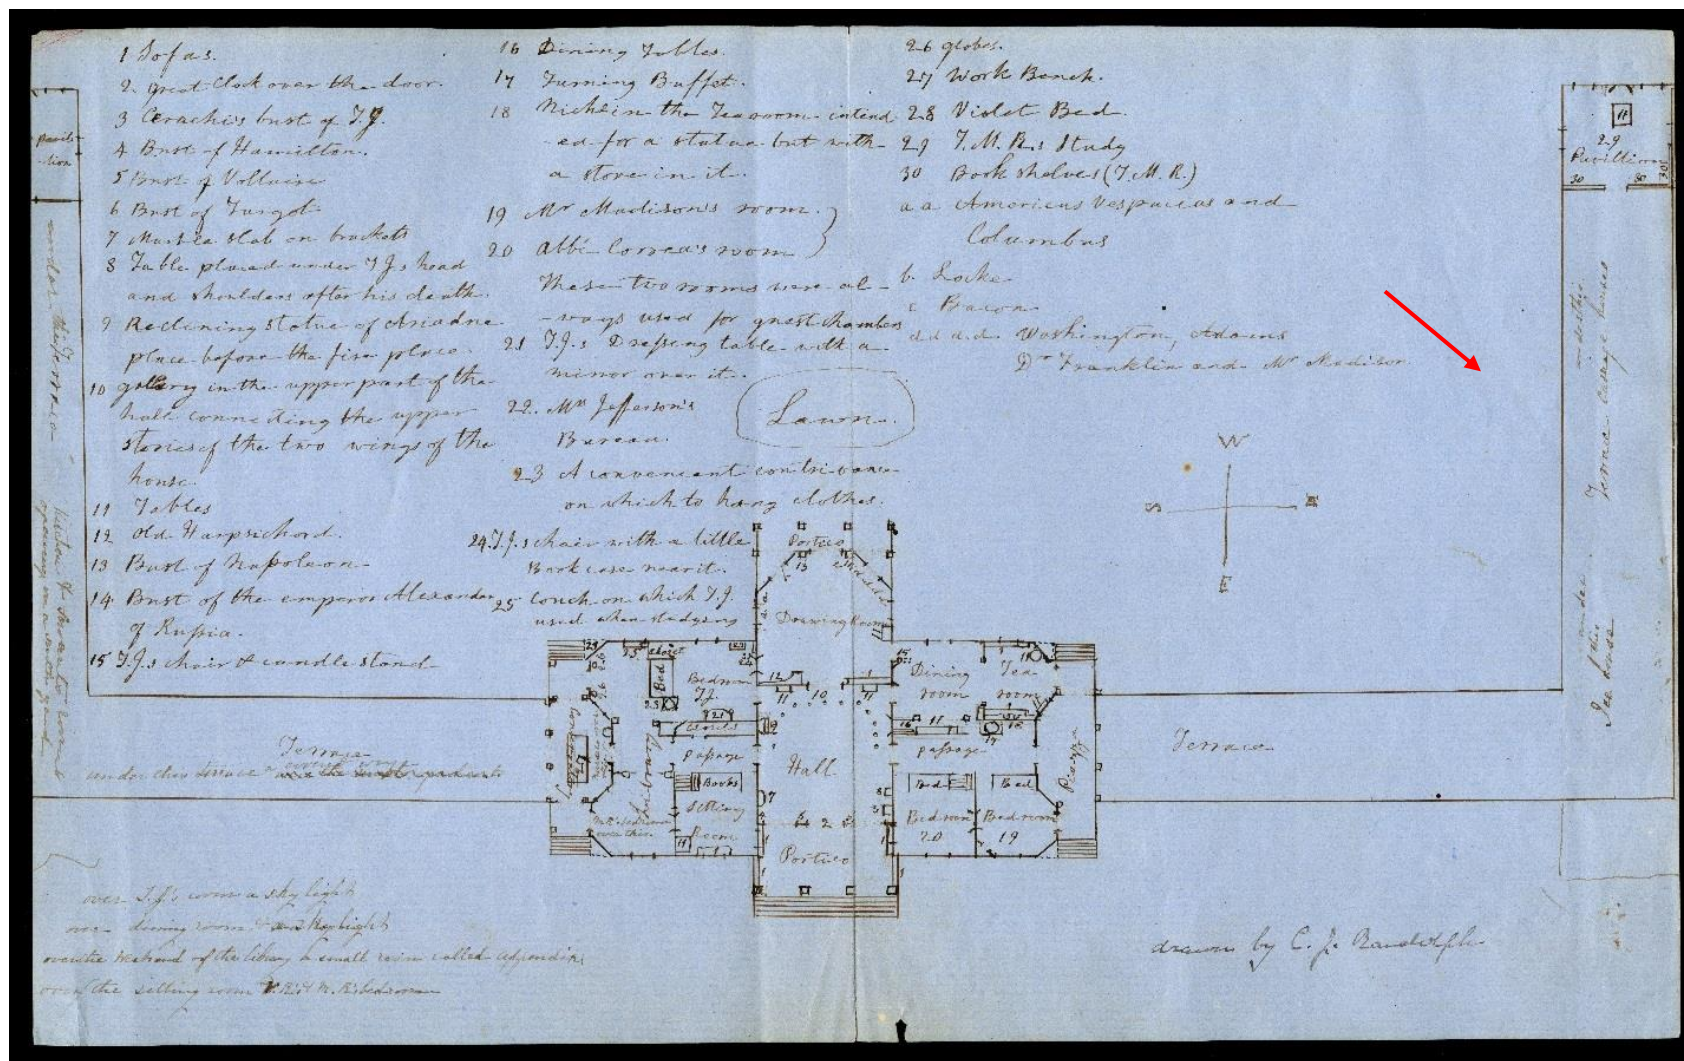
Plan of the first floor of Monticello by Cornelia Jefferson Randolph (Randolph 1826). Note the red arrow pointing to writing on the North Wing: “under this [terrace] carriage houses.”
